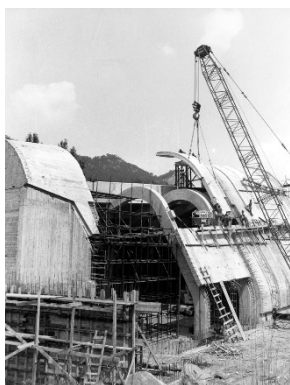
Riola Church under construction. Photo from Alvar Aalto Foundation
